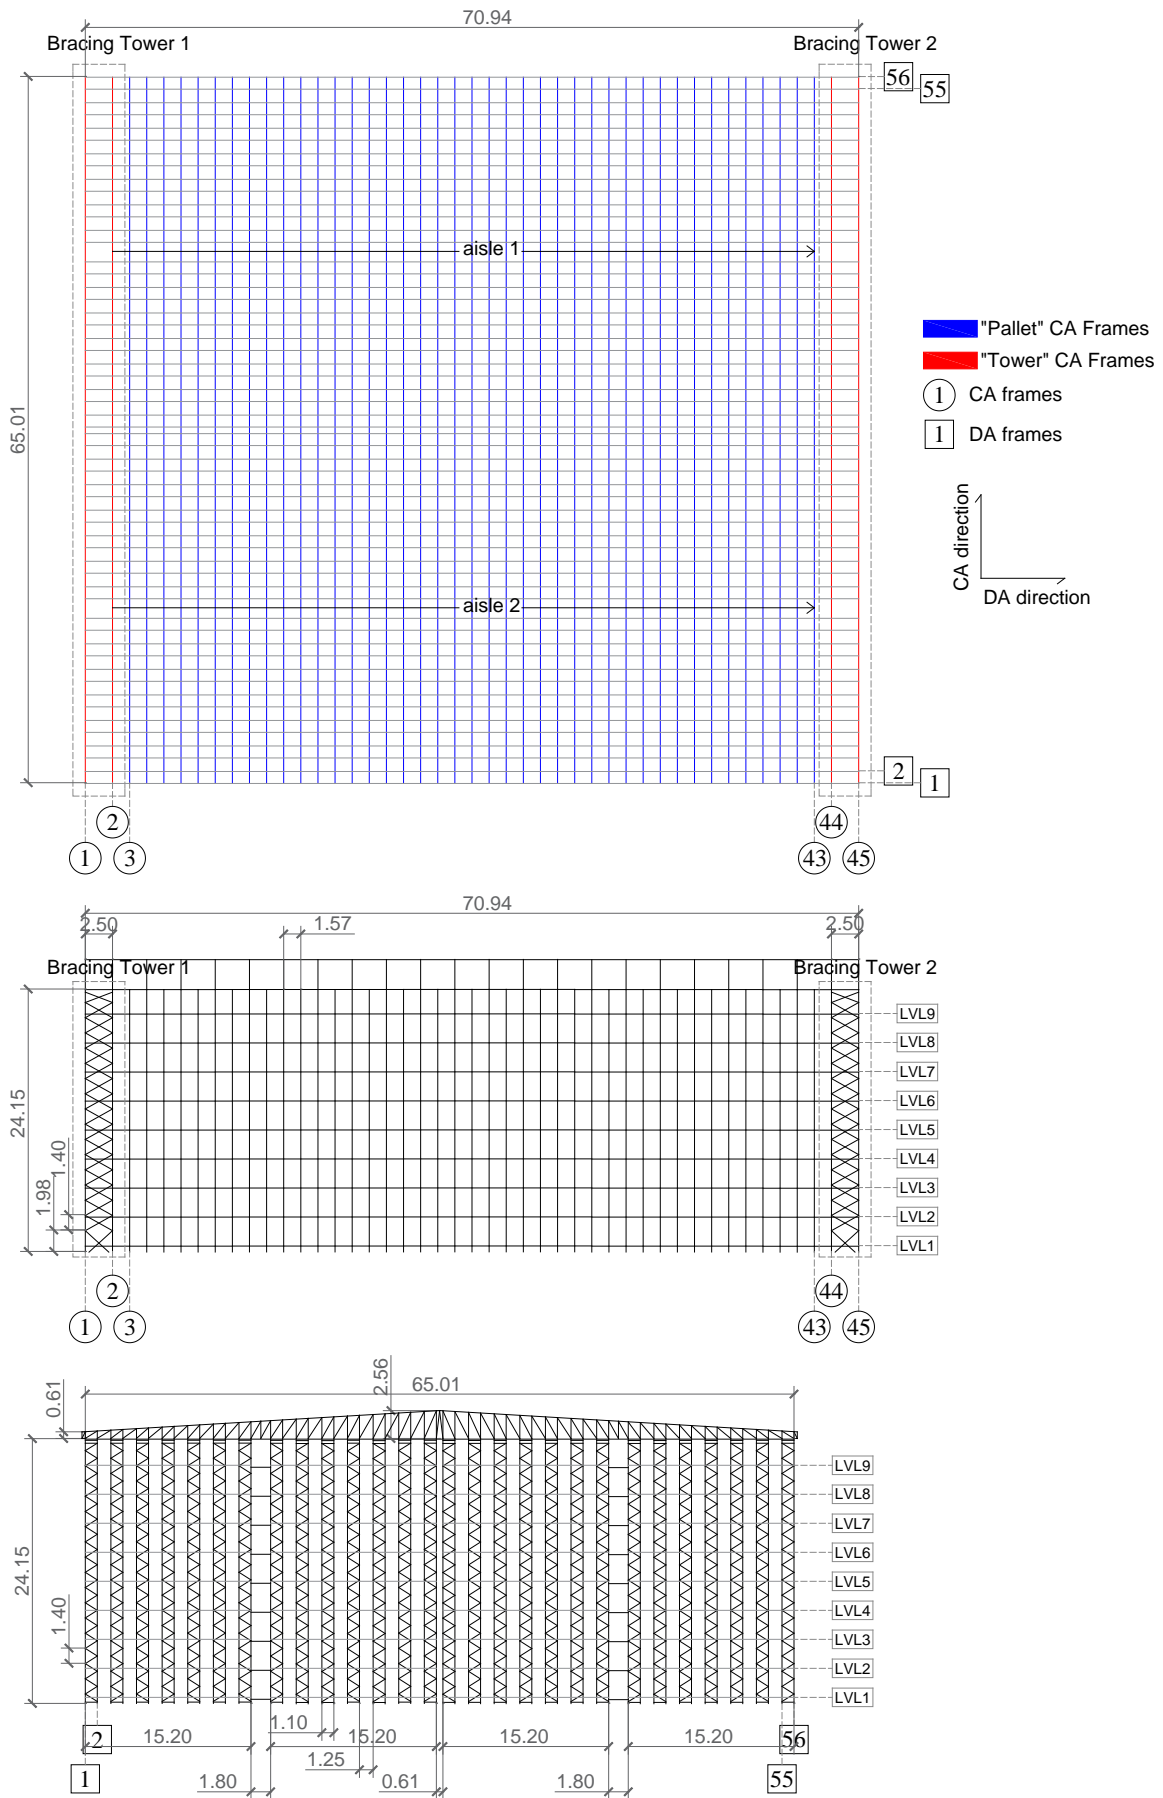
Structural configuration of CS5, showing plan, down- and cross-aisle views.
